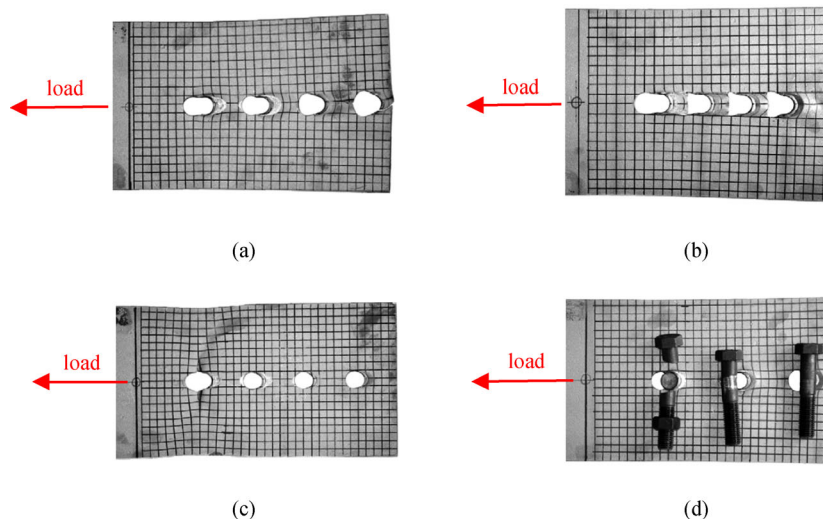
Failure mode of multi-bolt by Može and Beg [18]. (a) Splitting failure; (b) failure between bolts; (c) net cross-section failure; (d) bolt shear failure. (Reprinted from Journal of Constructional Steel Research, 67(3), Može P, Beg D, Investigation of high strength steel connections with several bolts in double shear, 333–347, Copyright 2011, with permission from Elsevier.)
